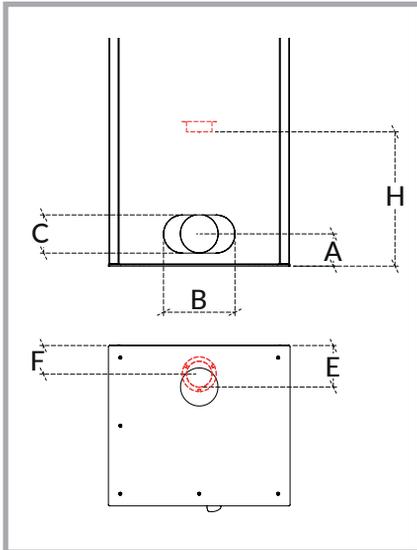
Installation with air intake in the room of installation and installation with air intake directly connected to the stove.
